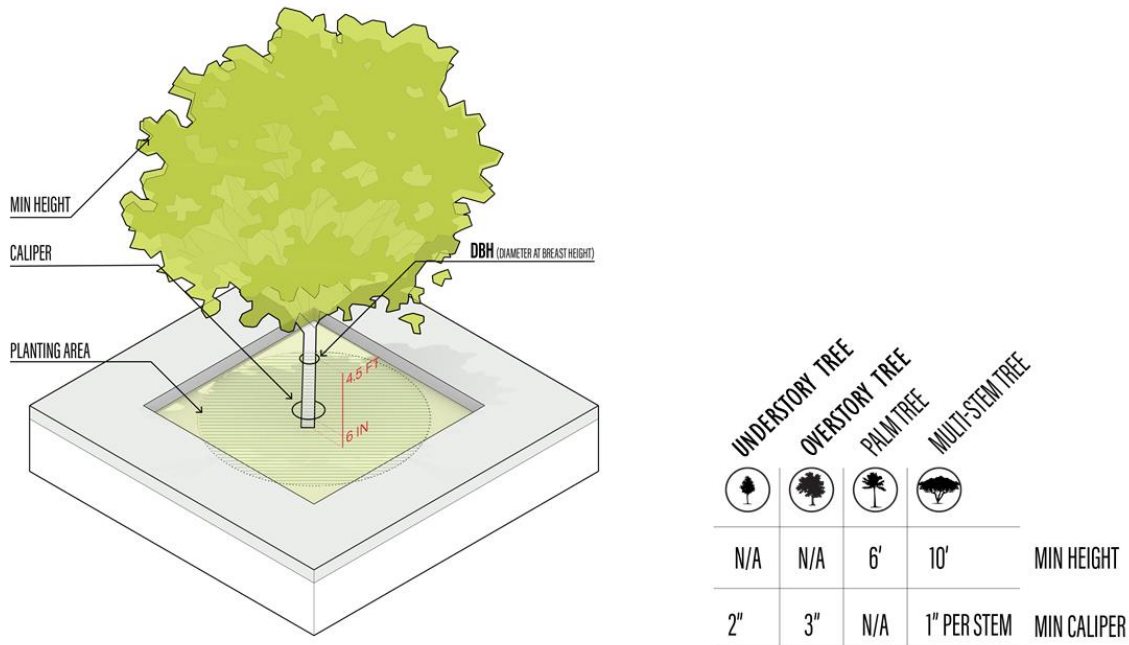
16 Minimum Planting Dimensions and Planting Area
